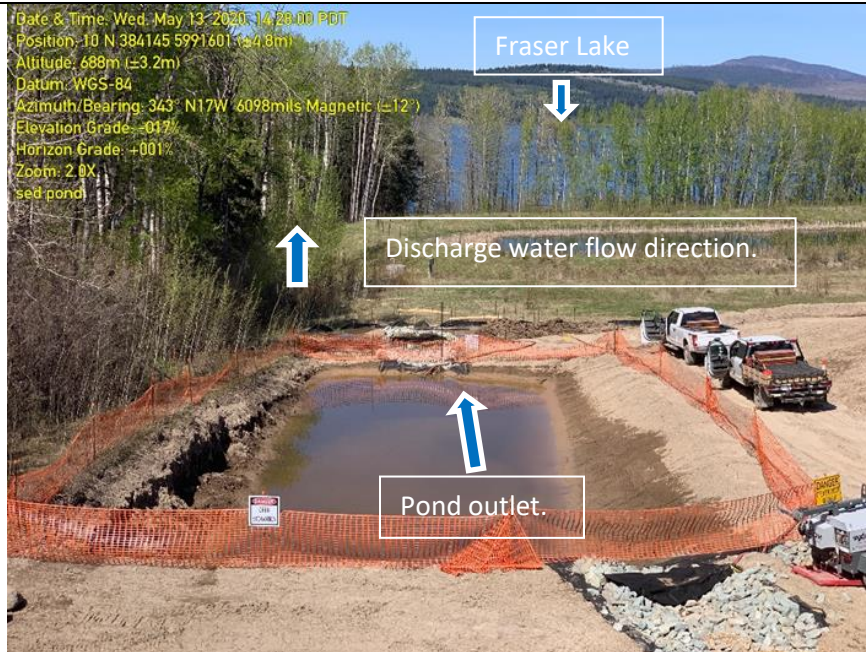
Settling pond with draw down taking place; high water mark visible. Note pond failure on left hand corner; introducing additional sediment into the pond.
